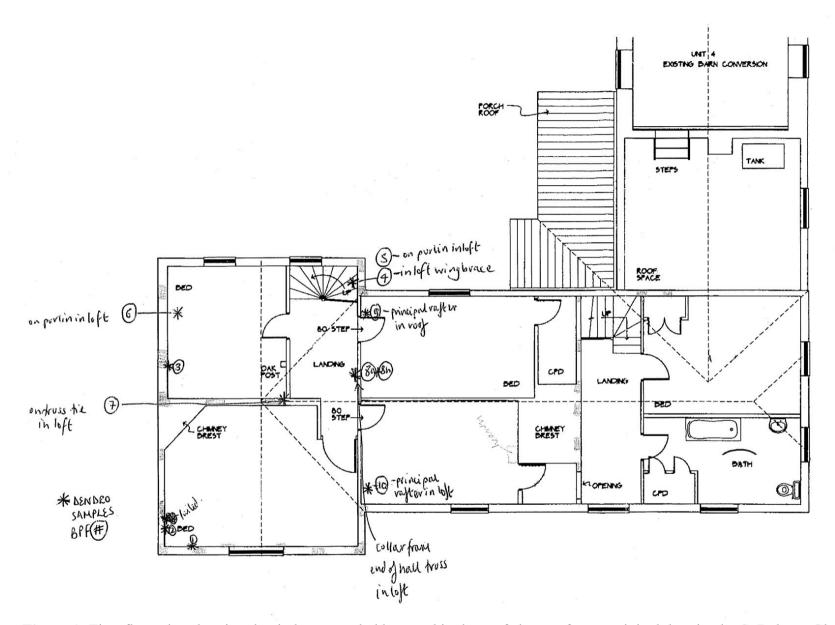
First-floor plan showing the timbers sampled here and in the roof above, after an original drawing by S. Robson-Glyde
